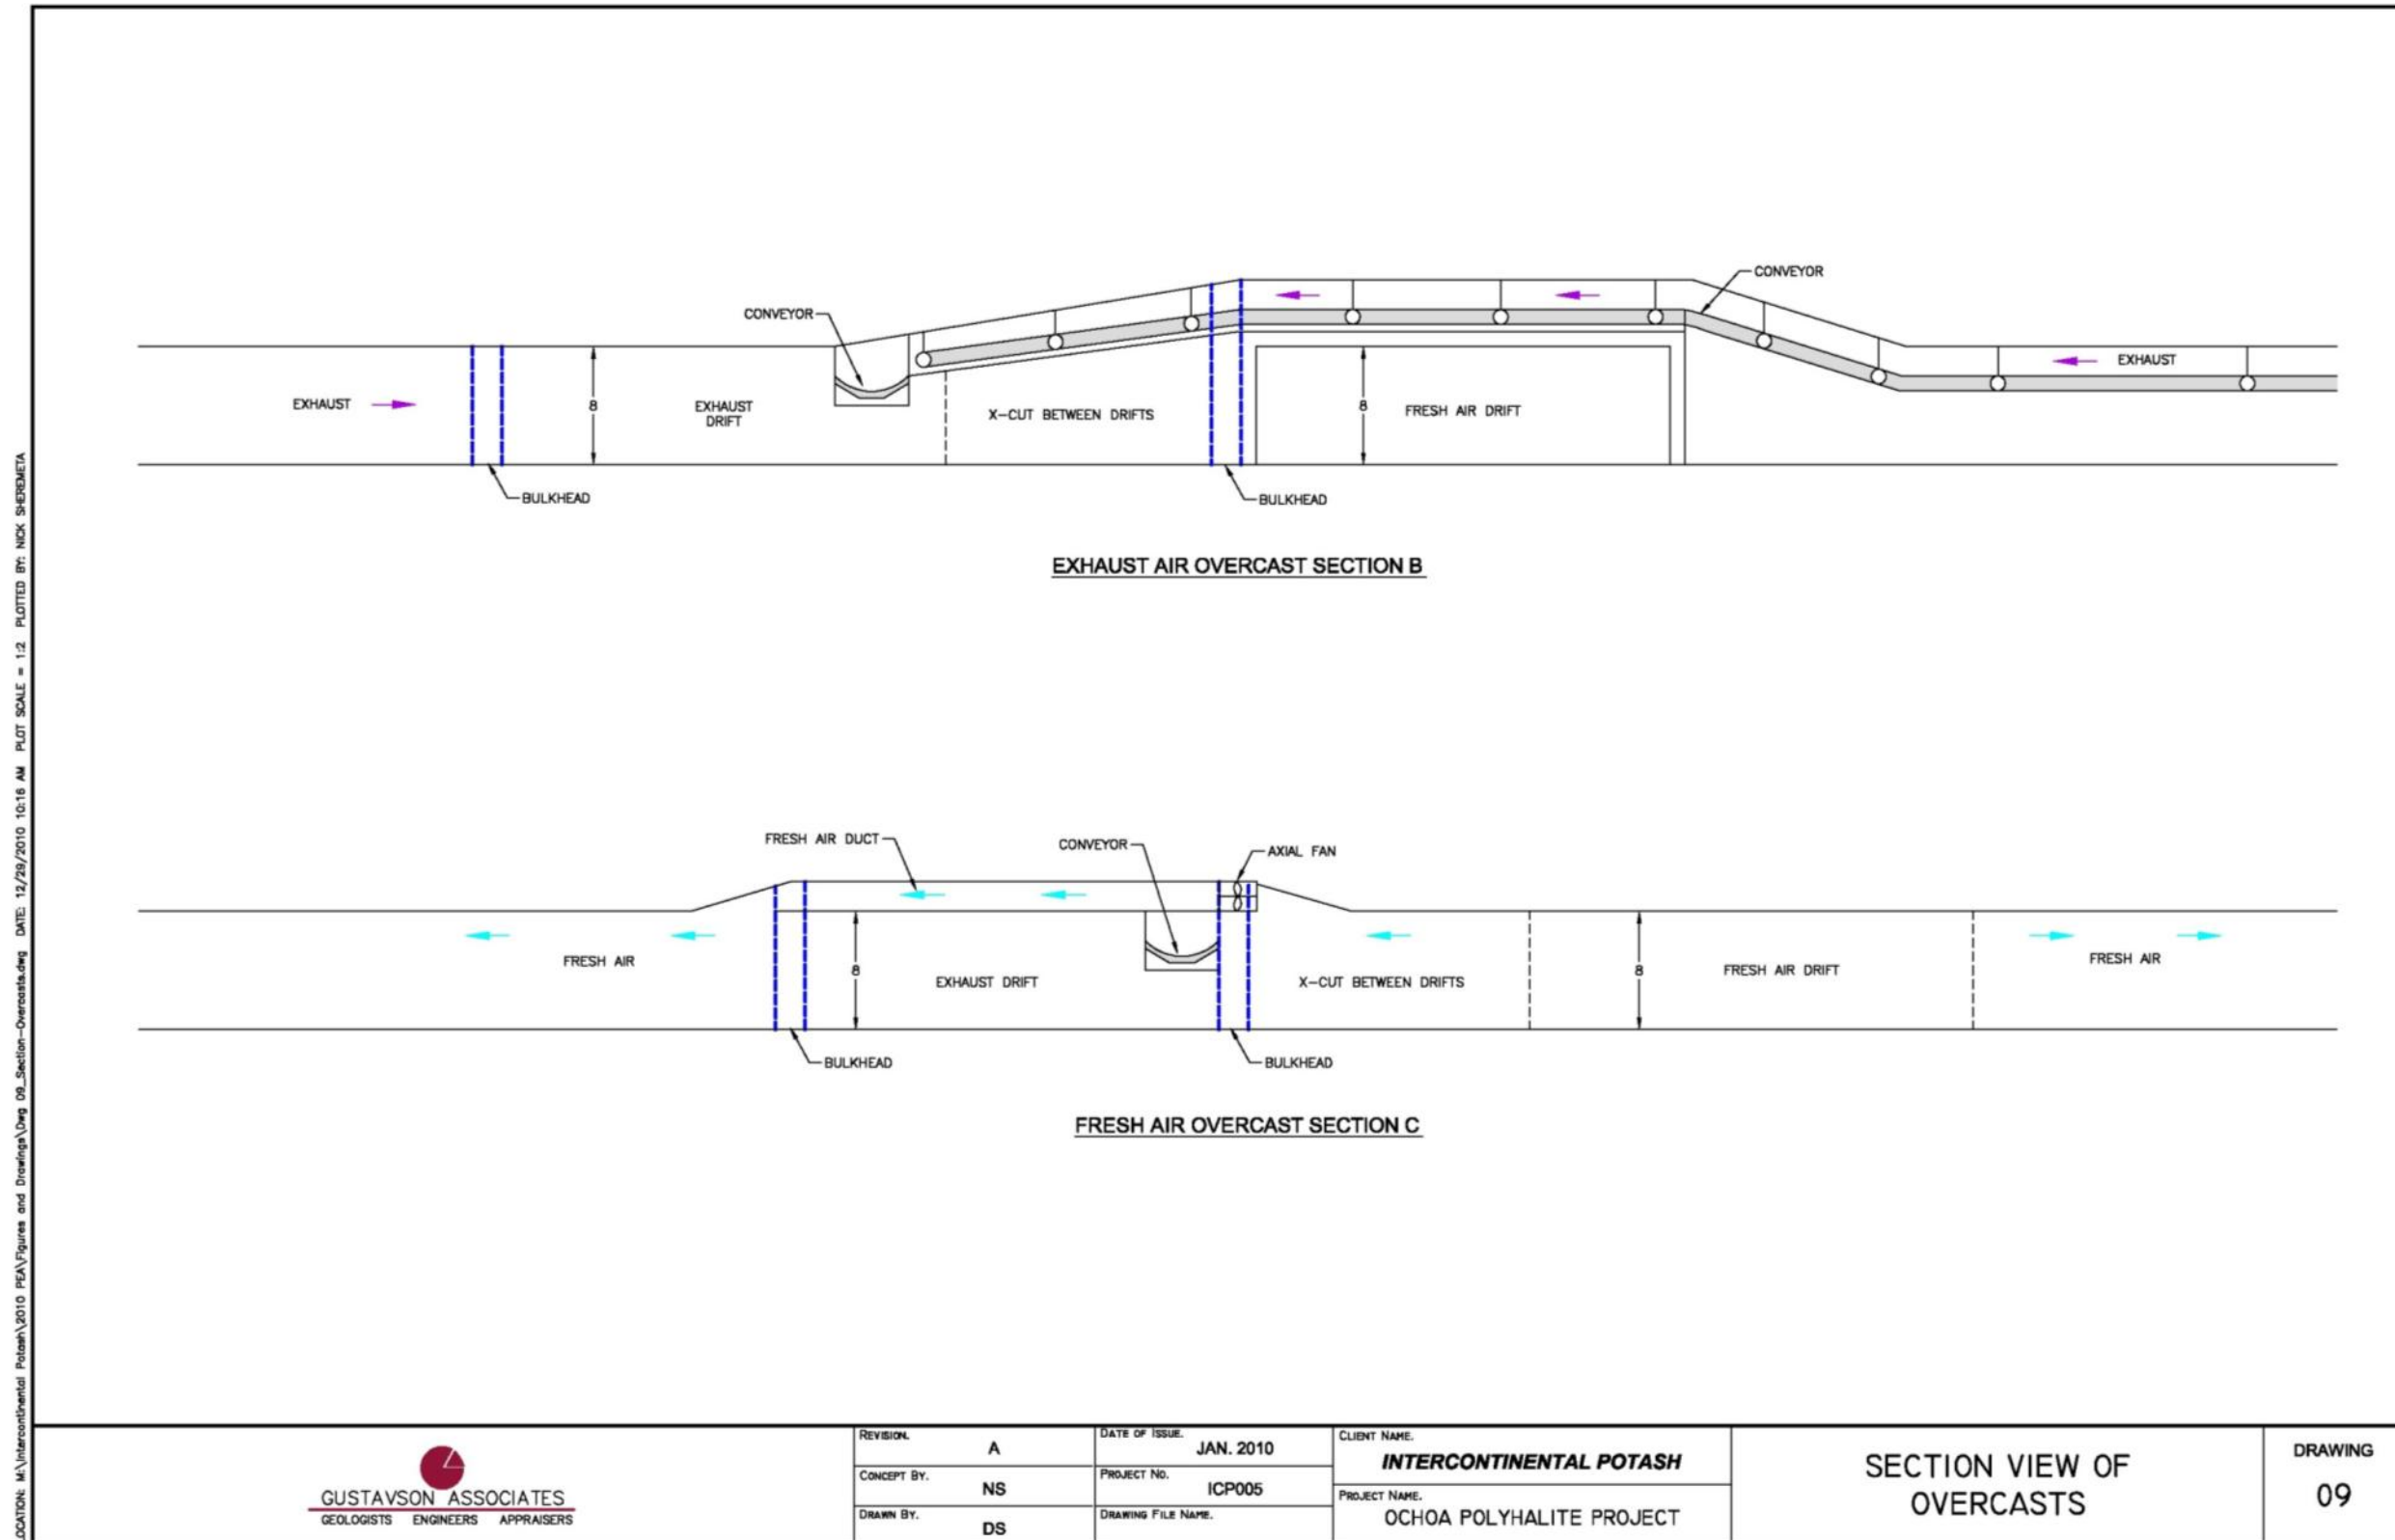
SECTION VIEW OF OVERCASTS
